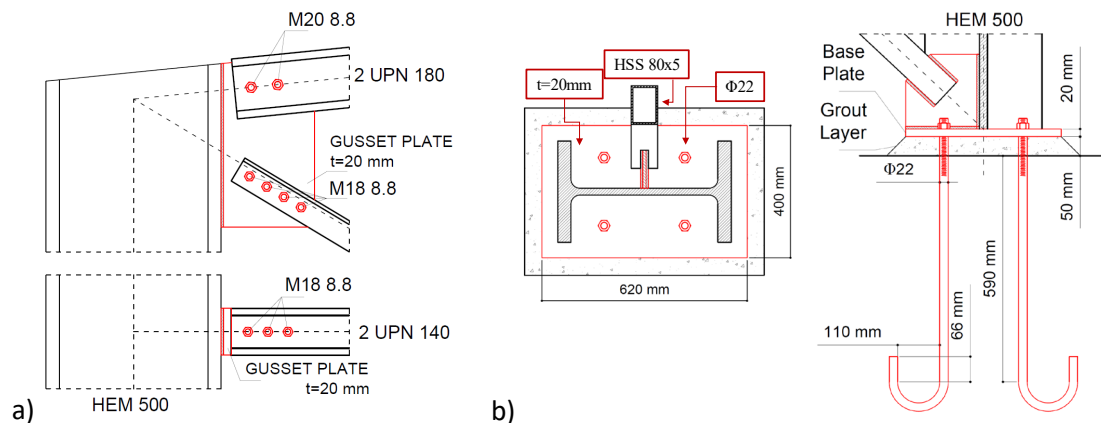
Connection design: (a) Truss-to-Column connection; (b) Column base connection.
